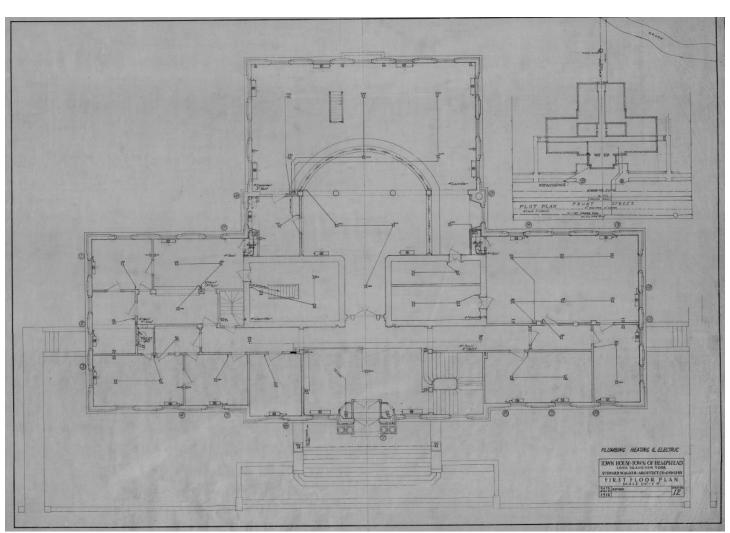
Old Town Hall, First Floor Plan, Steward Wagner, 1918
